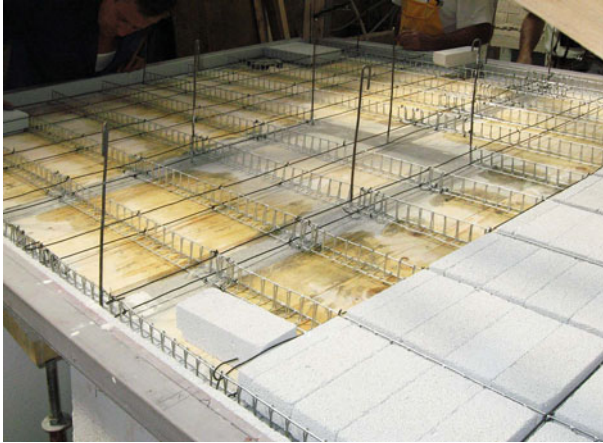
Reinforcement of T-beams and AAC filler blocks of Ytong® floors before concreting. Reinforcement of tie-columns can be also seen
